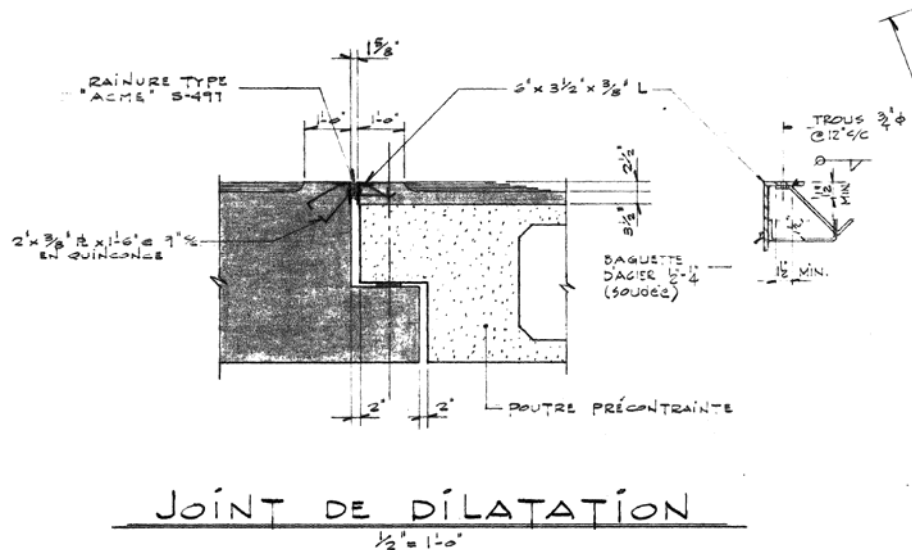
Details of pins and expansion joint reinforcement before revisions (COM-19, p. 8)
